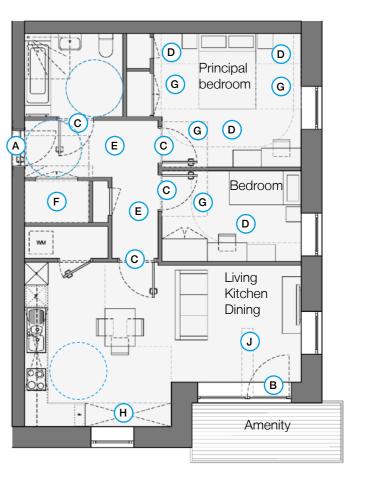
Typical 2 Bedroom43 Persons accessible layout
